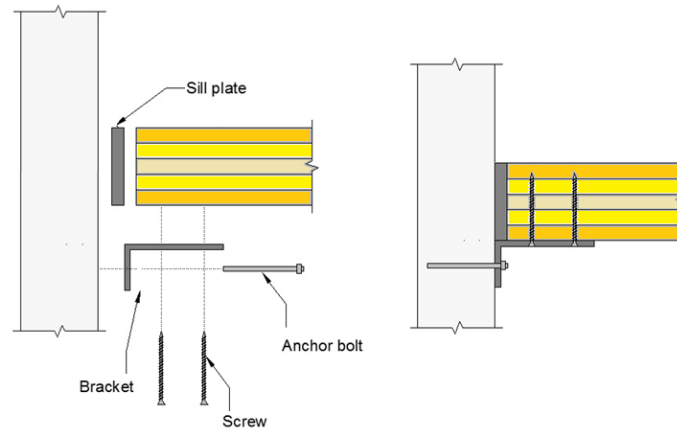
Angle bracket connection for floor-to-concrete/masonry wall.
